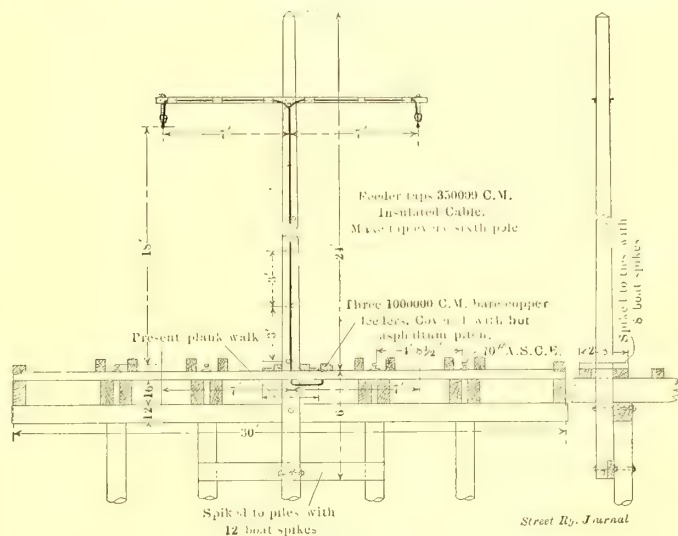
TROLLEY POLE CONSTRUCTION ON EMERYVILLE WHARF
